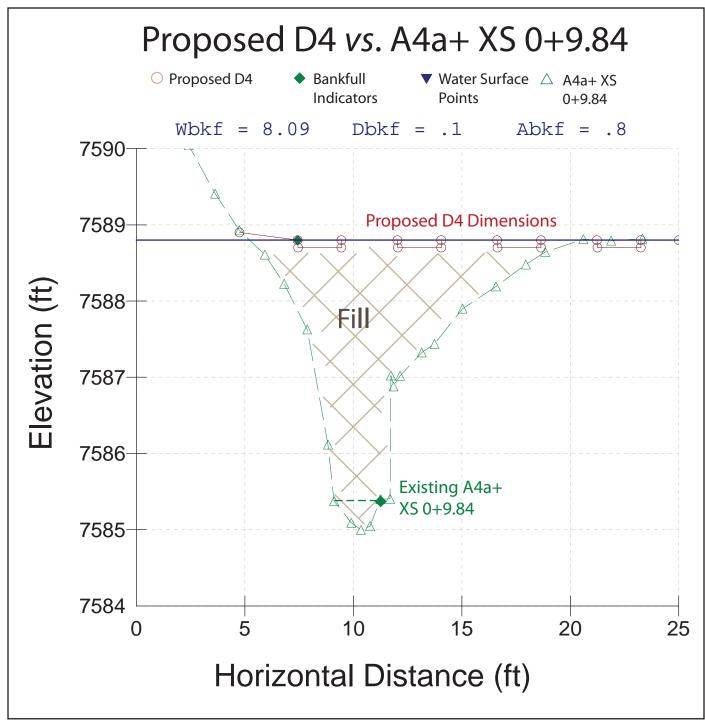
The proposed D4 cross-section *vs*. the existing A4a+ cross-section 0+9.84 indicating the extensive fill requirements.
